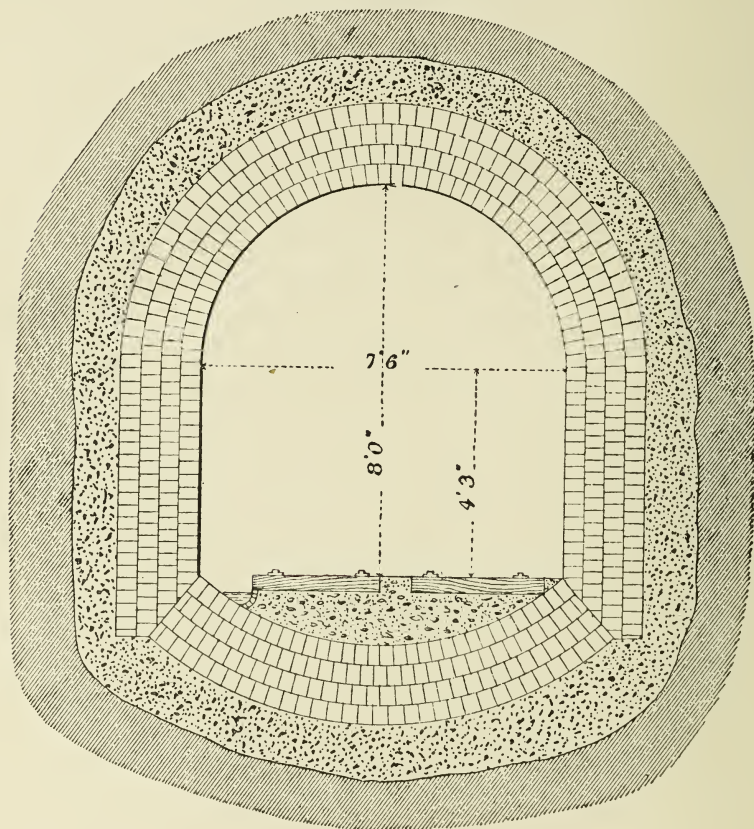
METHOD OF SECURING A ROADWAY BY WALLING WITH UPRIGHT SIDES, OVER WHICH IS TURNED A SEMI-CIRCULAR ARCH AND UNDERNEATH AN "INVERT," OR FLAT SEGMENT ARCH.
